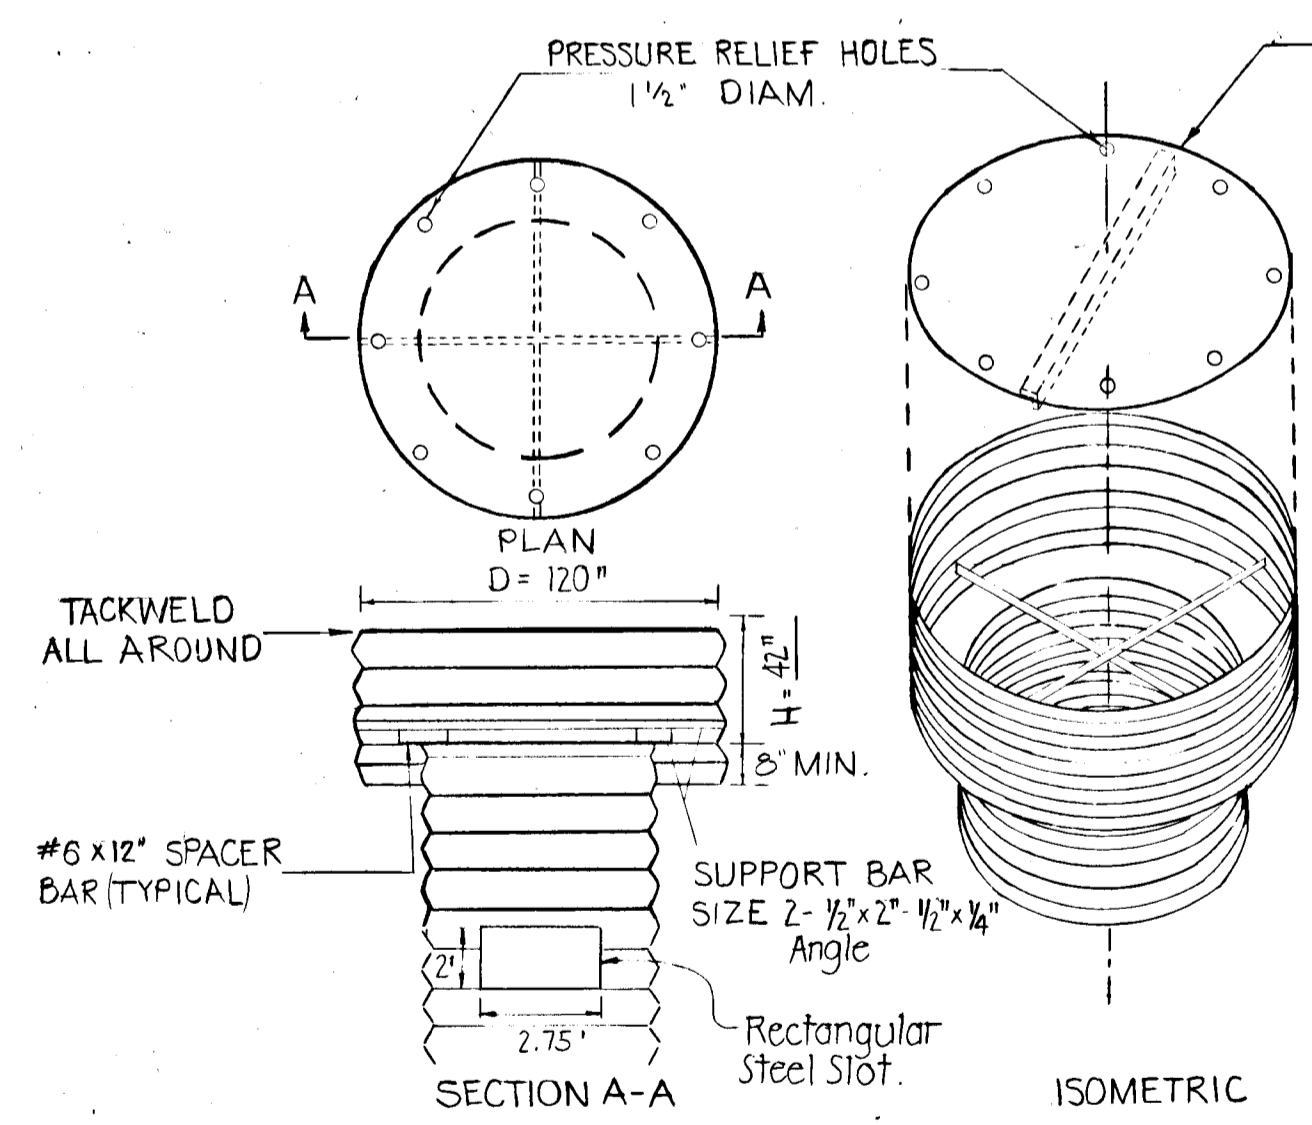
DETAILS OF CORRUGATED STEEL ANTI-SEEP COLLAR
